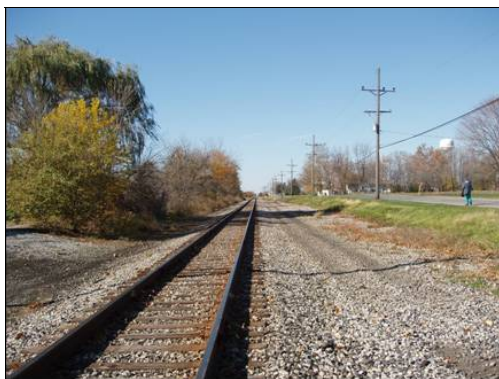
Fort Wayne Line, Washington St in Monroeville MP 304.3 – View west
